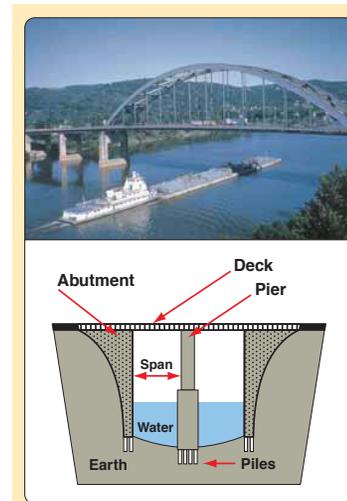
This diagram shows the parts of a bridge. An arch bridge is shown in the photo. (American Electric Power Co.)
